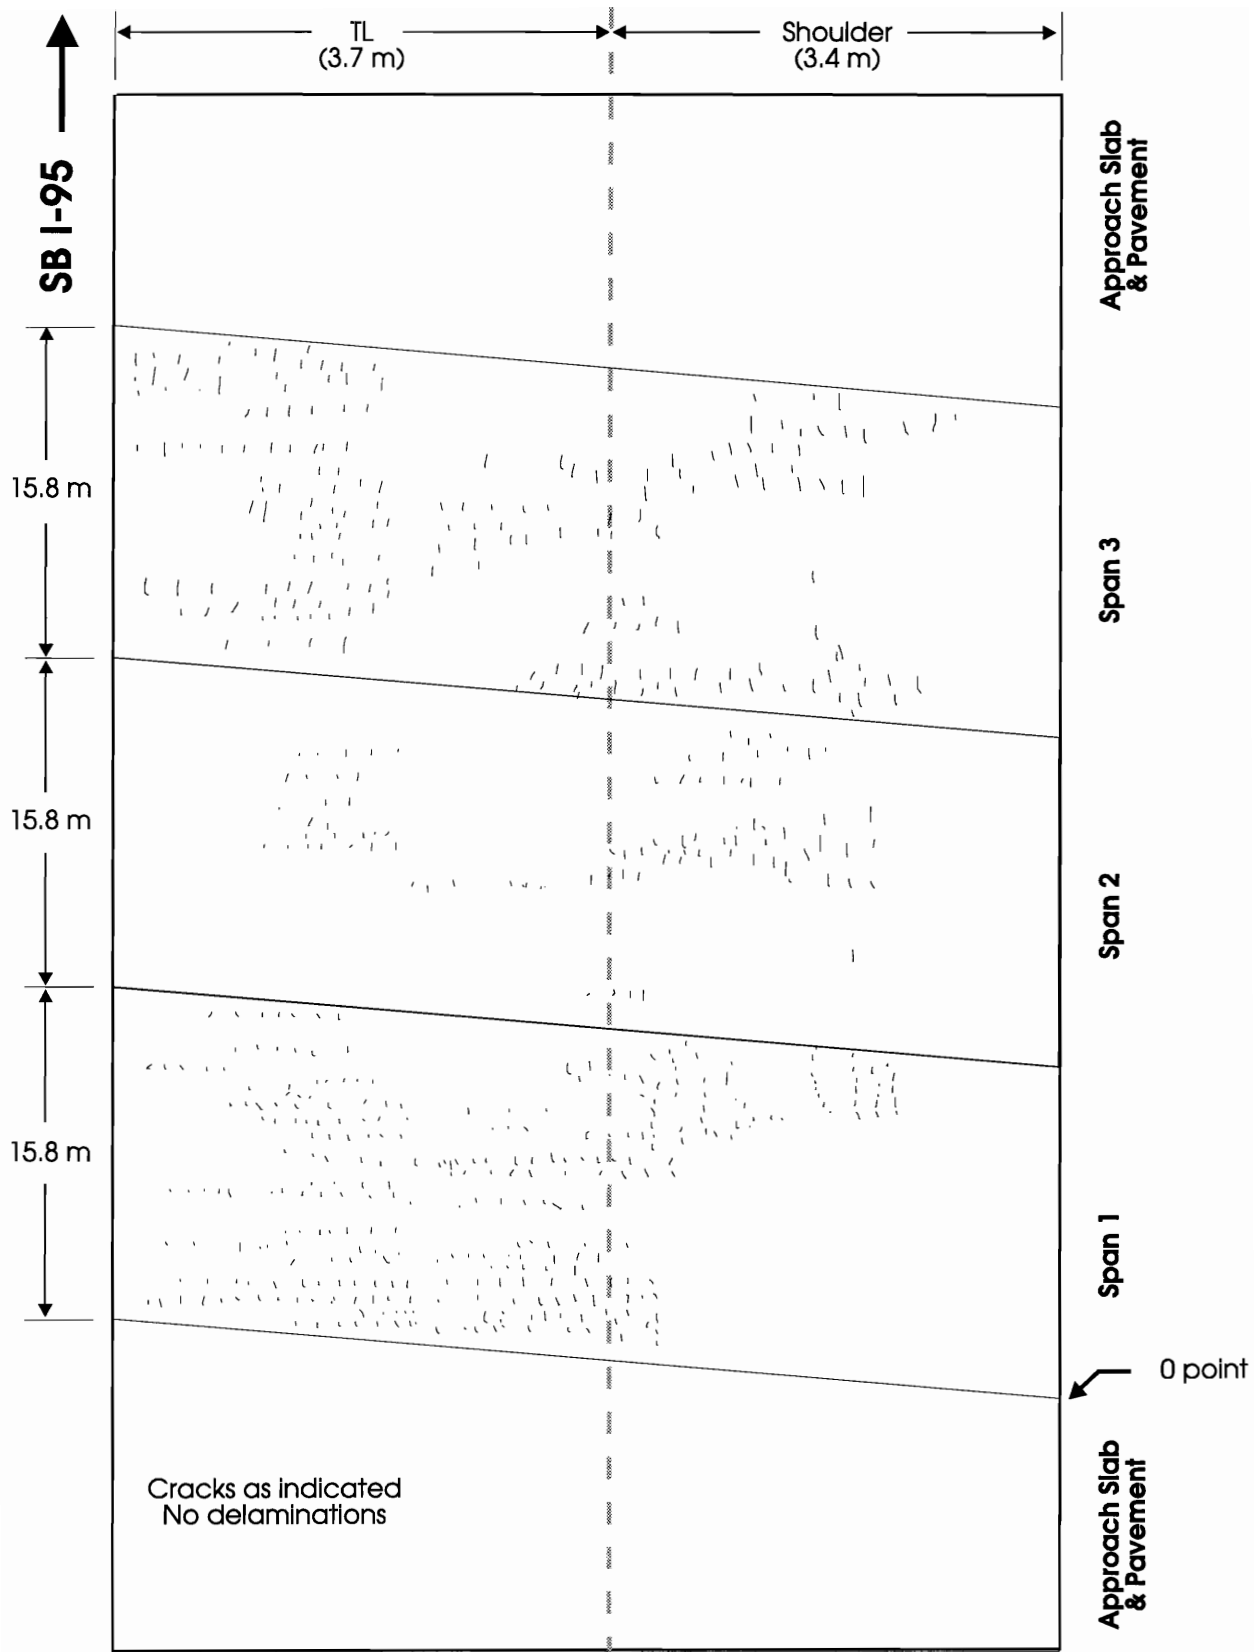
Cracks and delaminations in Bridge 5 SBL, TL and shoulder.
